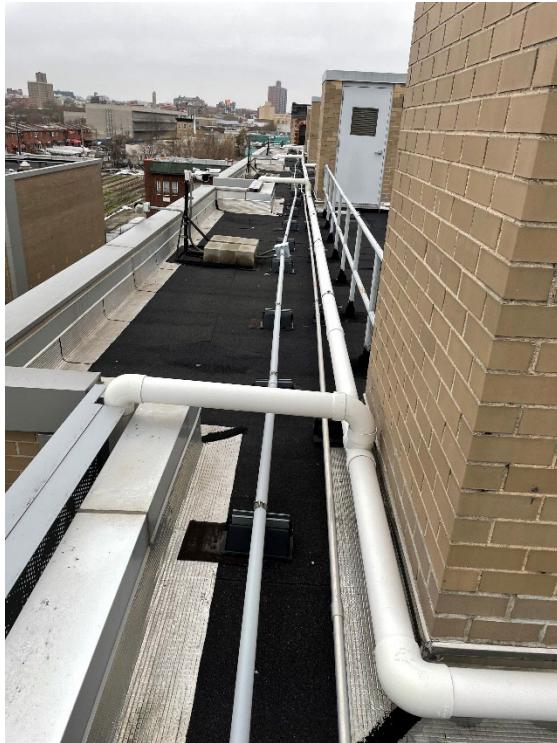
Looking north, photo showing SSDS piping run along the roof with legs heading down the residential side of the building.
